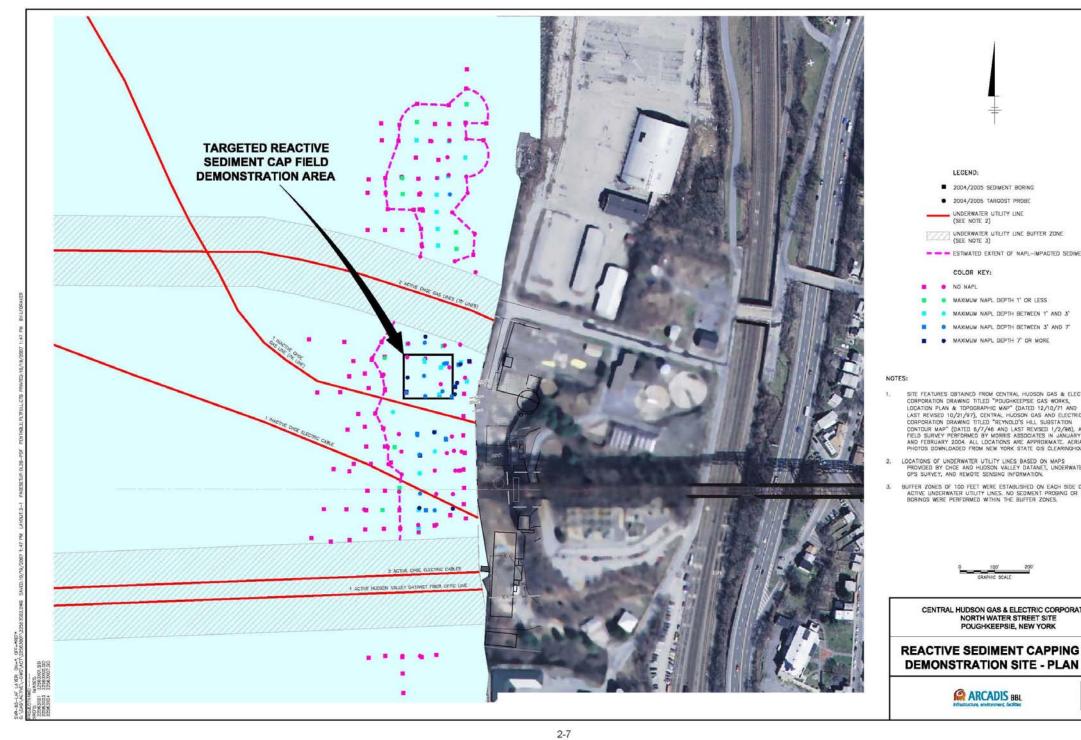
Reactive Sediment Capping Field Demonstration Site – Plan View
